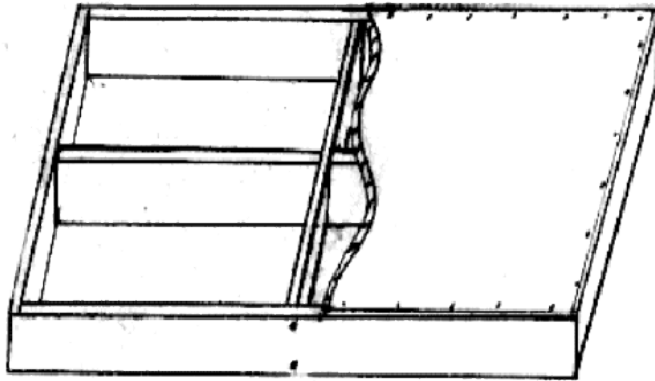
Construction of a typical platform. 2 inch lumber is used for the frame and 3/4 inch plywood is used for the top surface.
